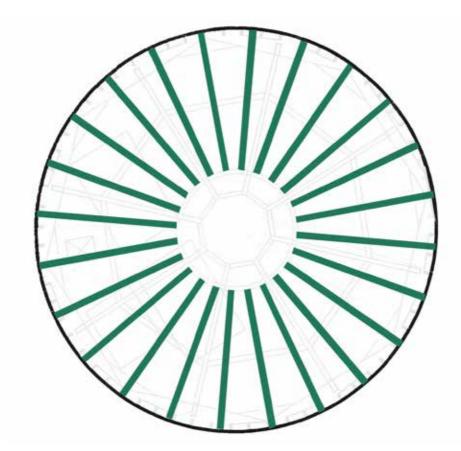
Timber roof rolls (L) in plan view (2019) © H&R (SLHA edit)
